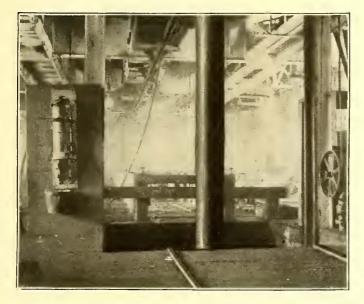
BOTTOM OF HYDRAULIC TRUCK ELEVATOR SHAFT, SHOWING TRACKS AND ELEVATOR PISTON
